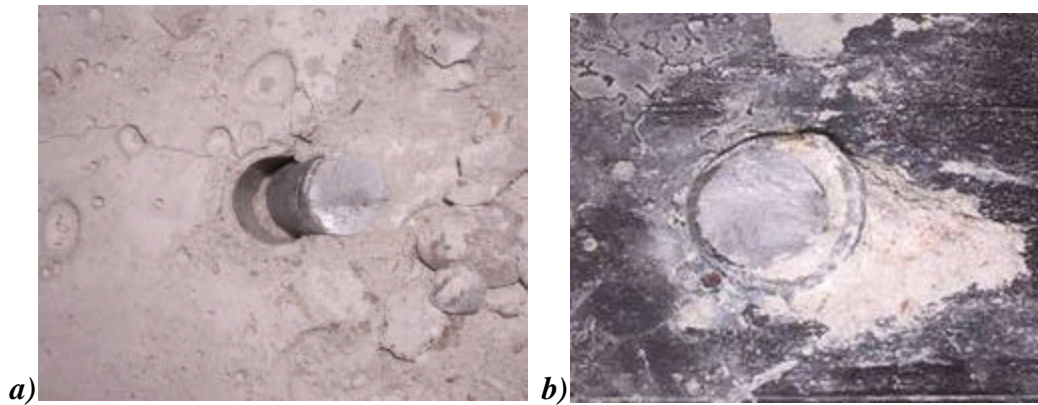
Failed Specimen CIPST-ST: a) concrete block, b) steel plate
